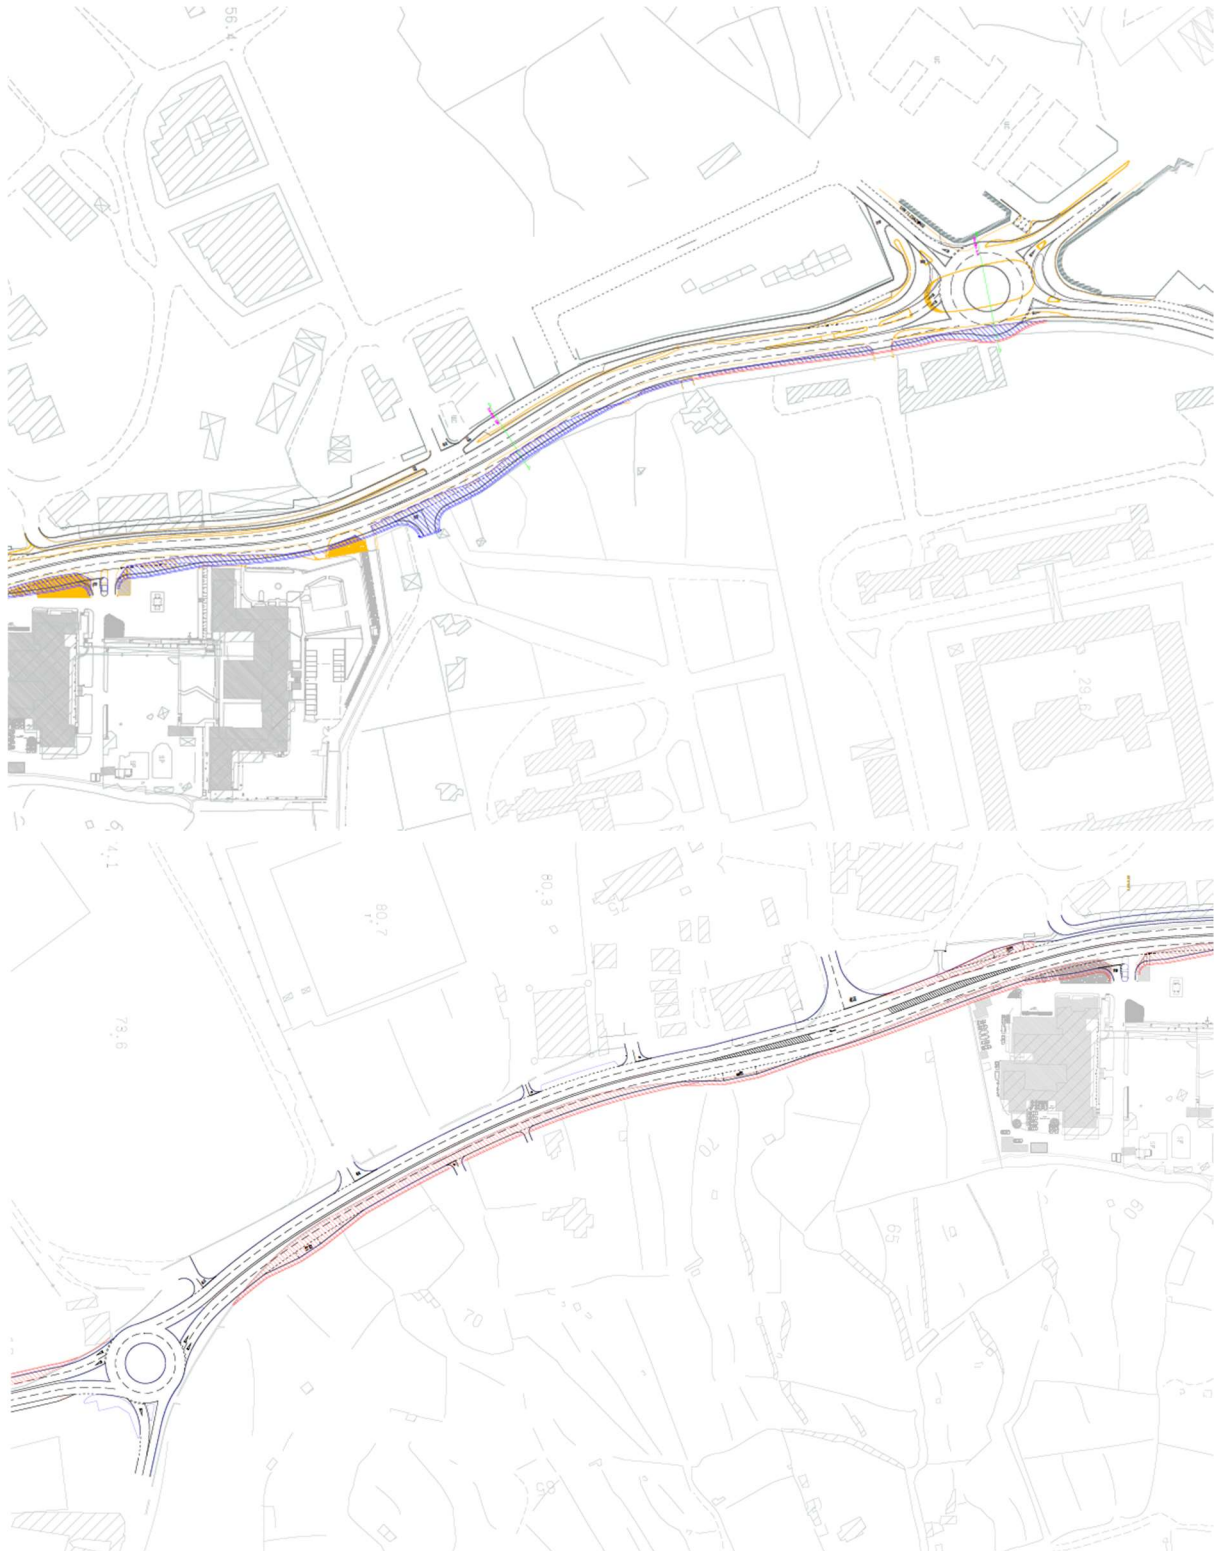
Detailed block plan of the Proposed road works/widening at Triq Ħal-Qormi
